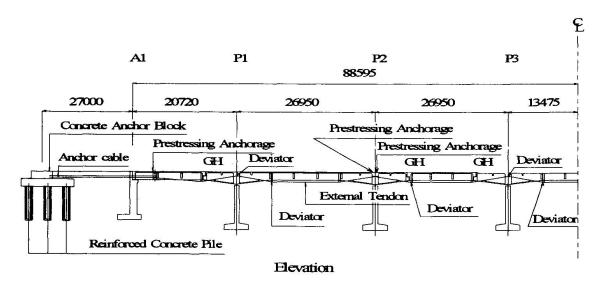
Cable Layout for Continuous Concrete Gerber Girder Bridge
